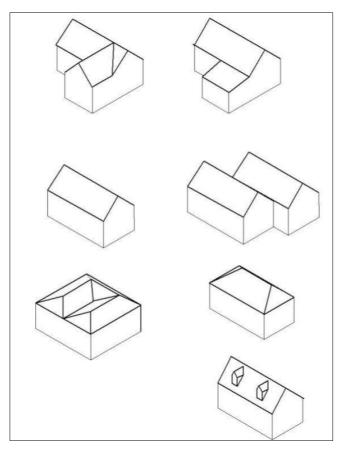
Roof forms as required by clause NOR-S8.7.2 A1
